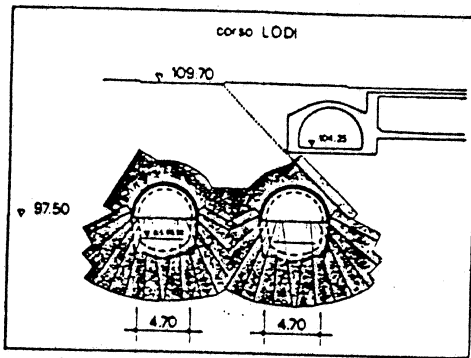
Permeation Grouting From Surface (to g.w.l.) Plus Steel Micropiles for Underpinning, Followed by Grouting from Pilot Under gwl, Milano Metro.
